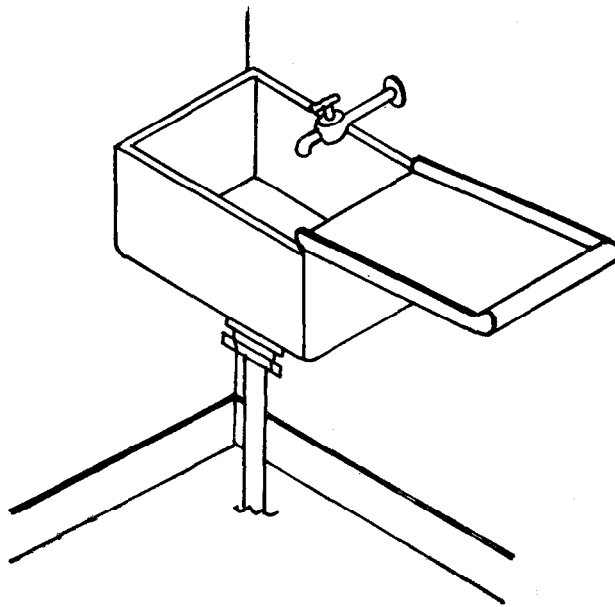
TYPICAL ARRANGEMENT OF PLACEMENT OF DRAINING BOARD
